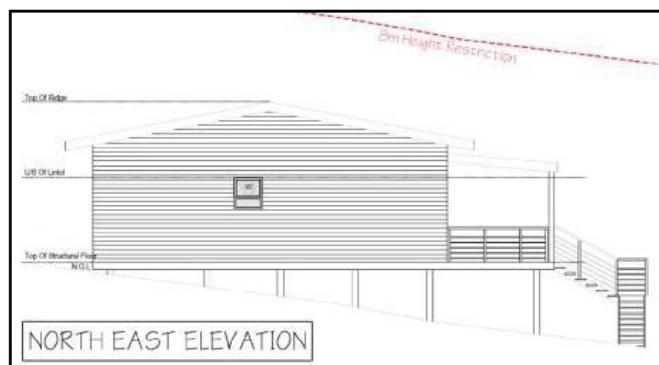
ELEVATION OF PROPOSED GROUP HOUSING UNITS
